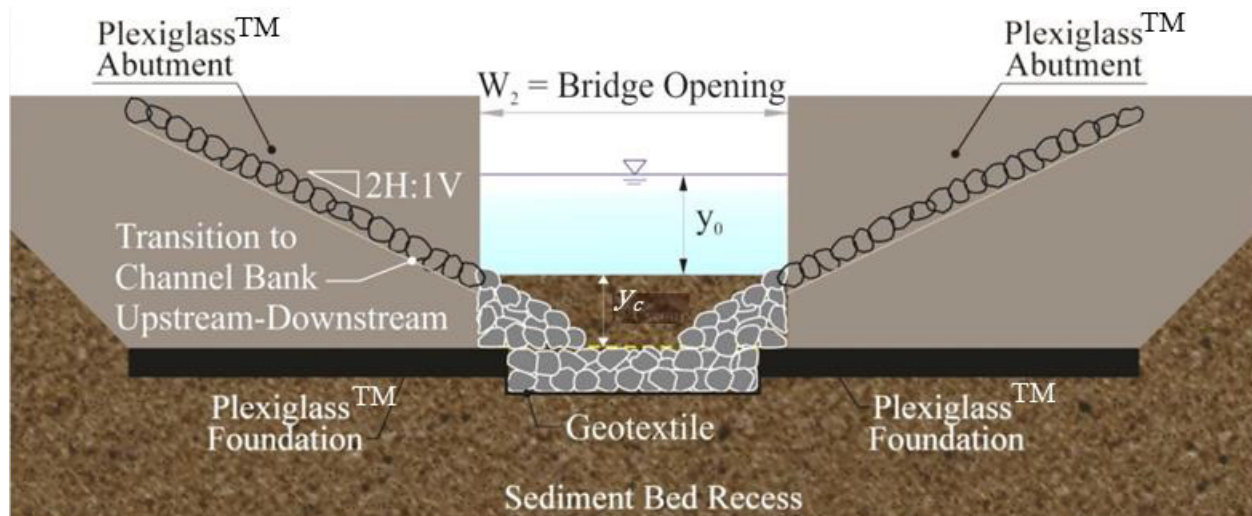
Sketch. Run 9 cross section—buried full-width sloped.
